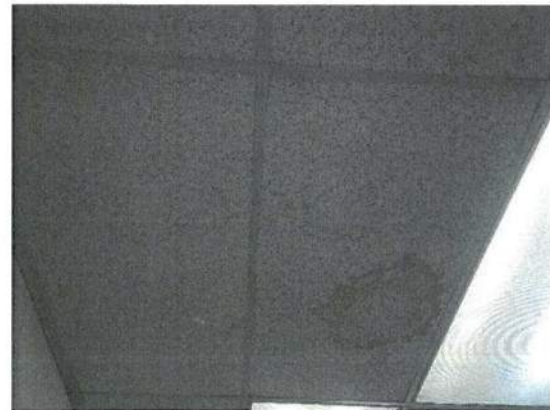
Ceiling Tile – Throughout Main Floor (ND)
